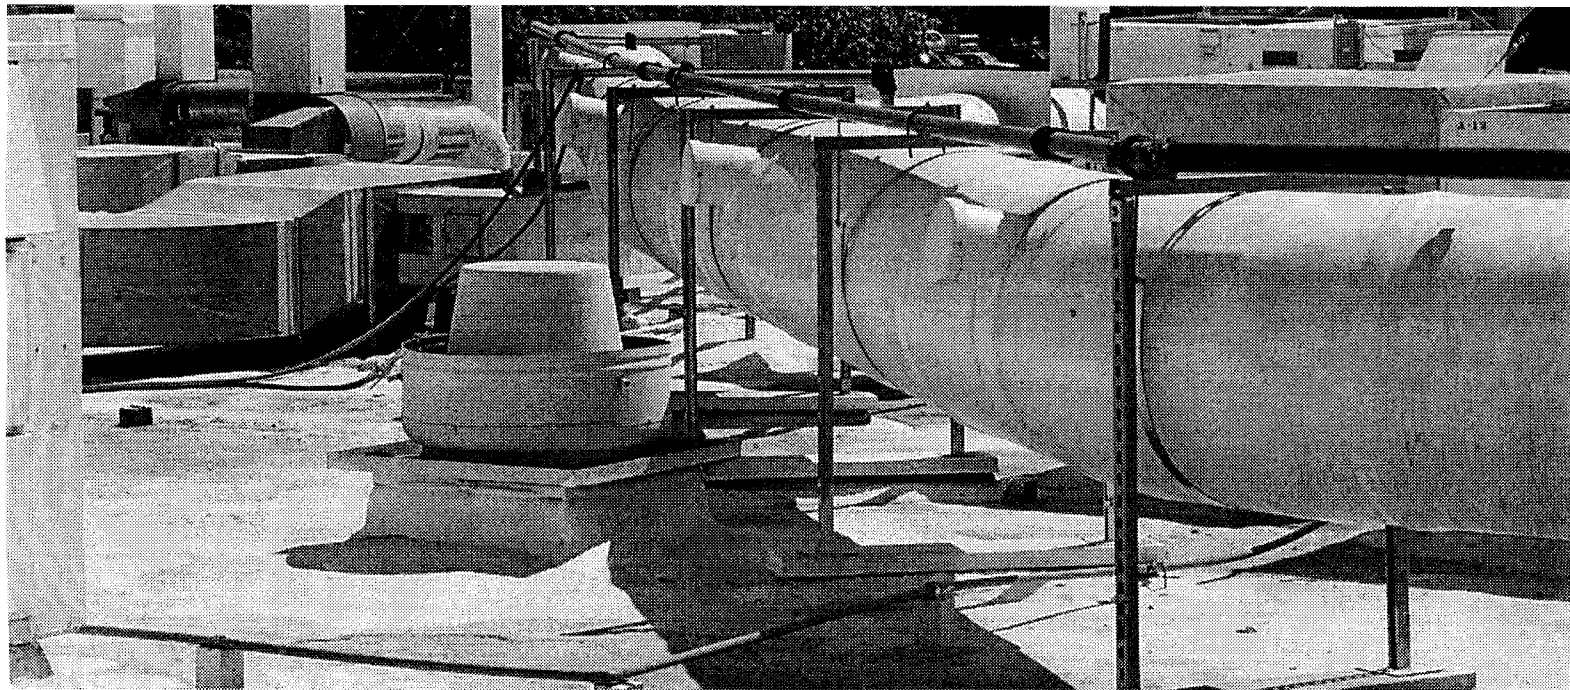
This roof is littered with rooftop equipment. Reroofing such a roof system presents a difficult challenge to roof system designers and roofing contractors.
